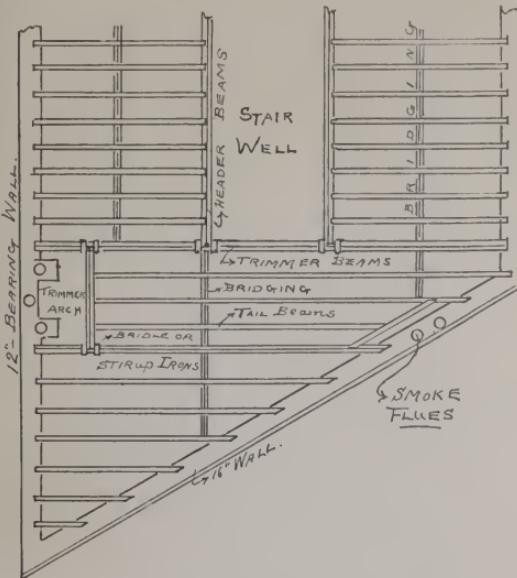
FRAMING PLAN OF A BRICK CITY HOUSE.
